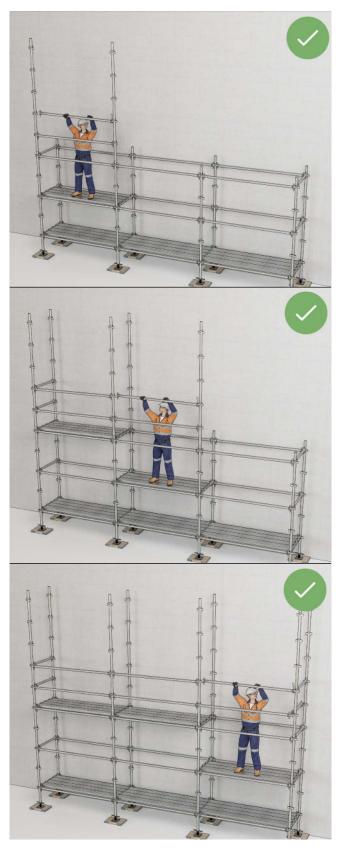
An example of scaffold erection method – 1 m lift. Some scaffold components such as toeboards and access ladders are omitted for clarity.
